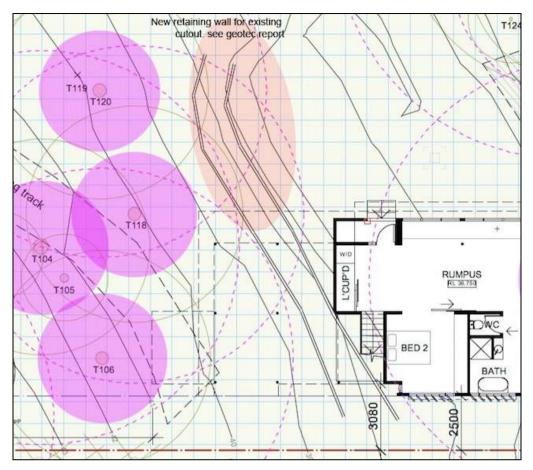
Stage 1 Plan excerpt, (Source: Proposed Plans by Design Waves, Rev A, 21/09/21)
